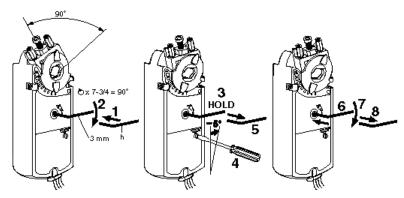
Fasten the Shaft Adapter to the Damper Shaft.
